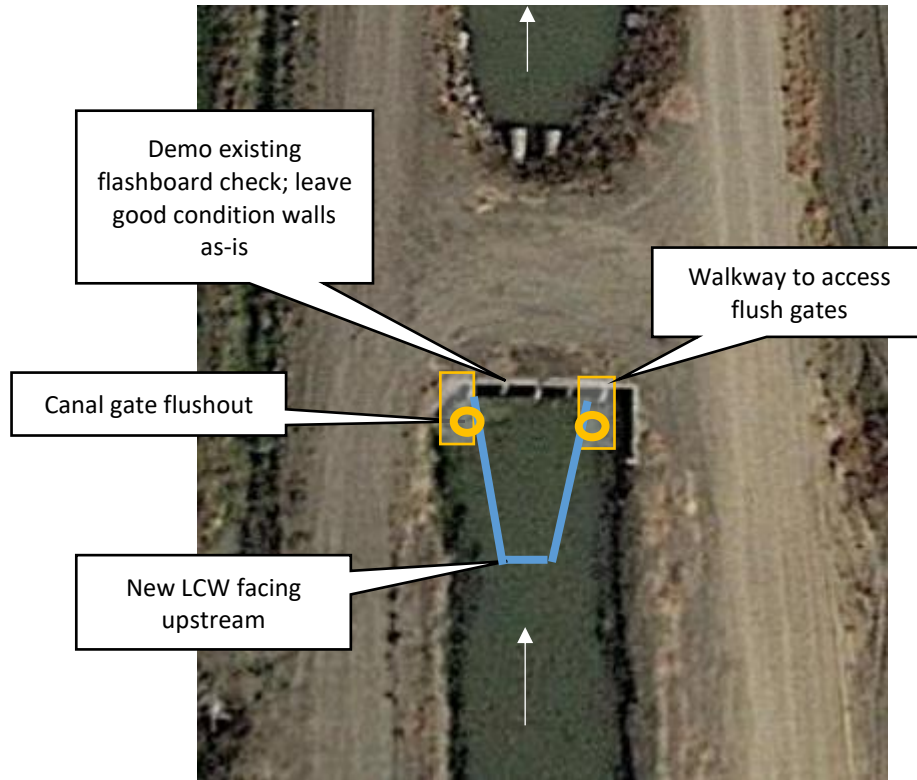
Laguna Canal check structure improvement concept; plan view overlaying the second Laguna Canal check
